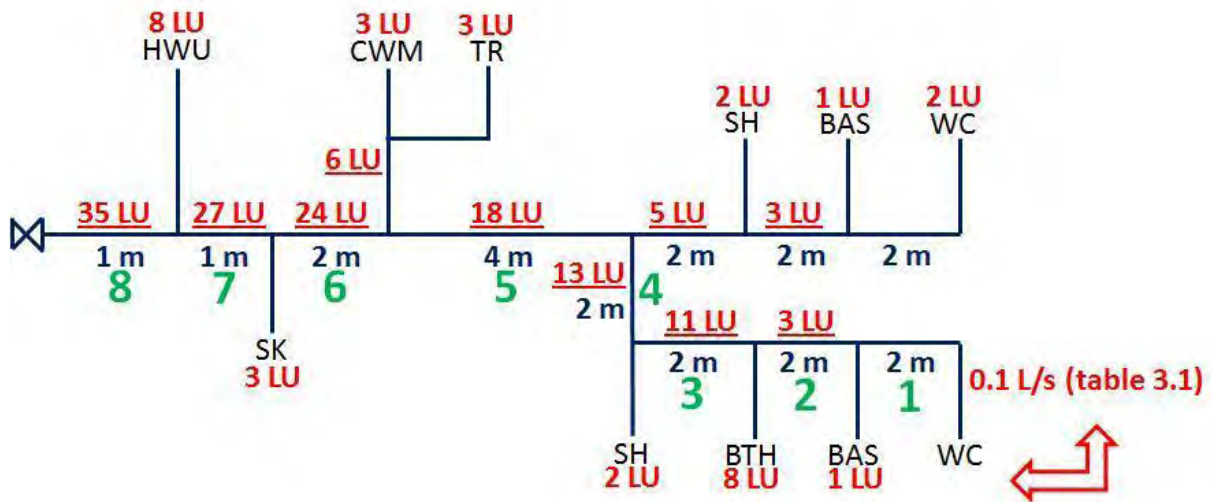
Example project: Schematic arrangement of piping within Apartment 10
